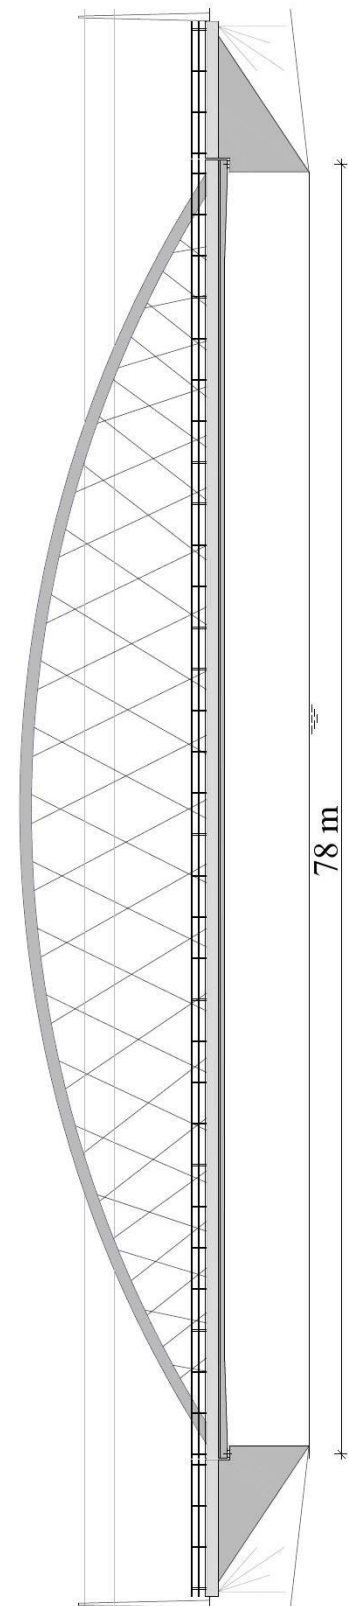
A network arch railway bridge built over national highway B6 at Halle
